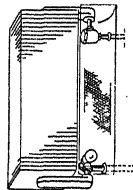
FIN-TYPE HEATING UNIT VALVES BEHIND GRILLE
